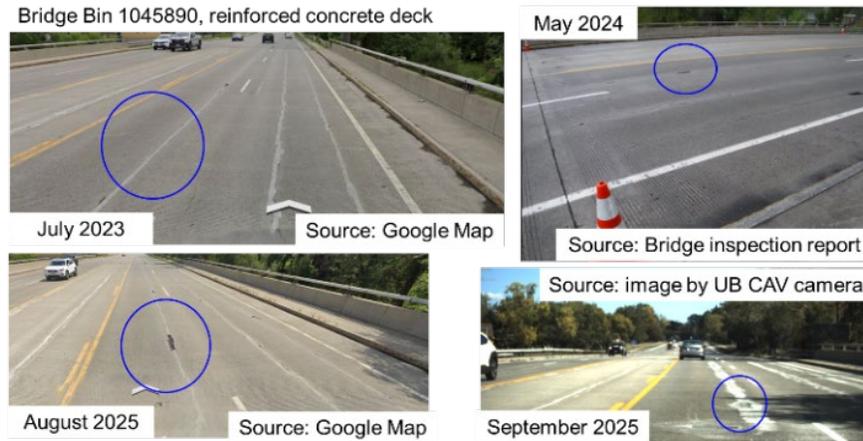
Pilot Bridge Deck Reflective Crack Evolution
